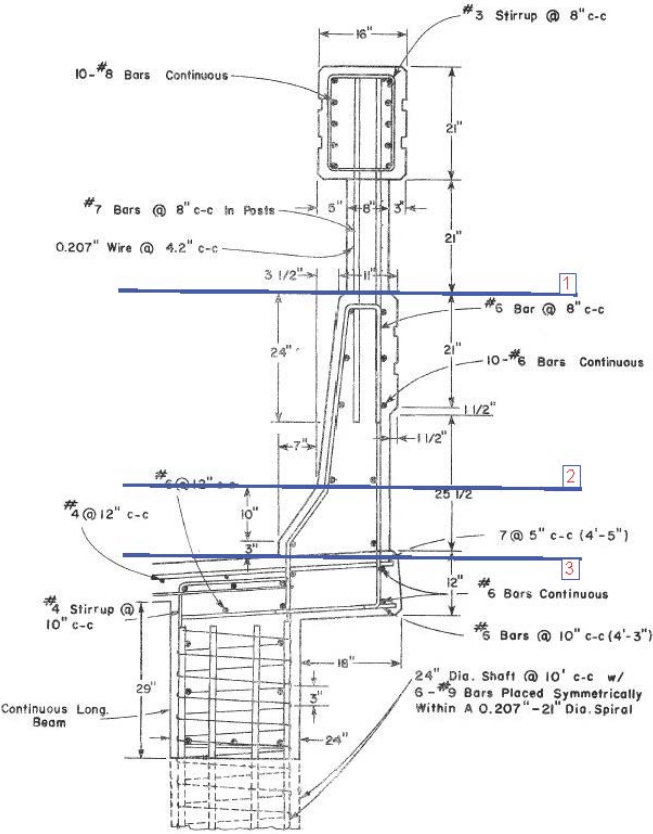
Cross Section of the Modified T5 Bridge Rail and Modified Bridge Deck.
